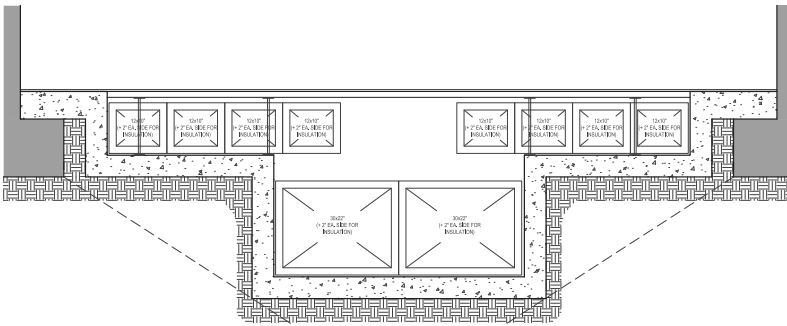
Typical Garden Level Trench at Main Corridor
